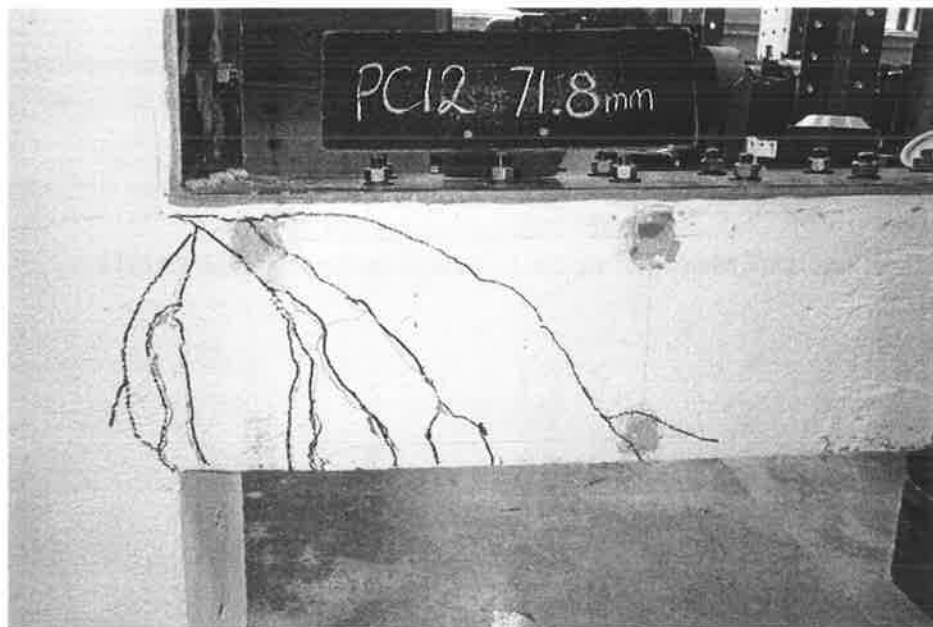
Front view after test showing major cracks for specimen 2AMF12
